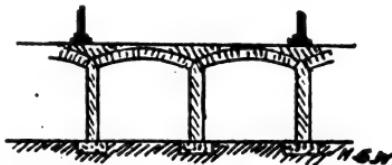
Foundation laid on Arches to avoid Subsoil Air and Water.
